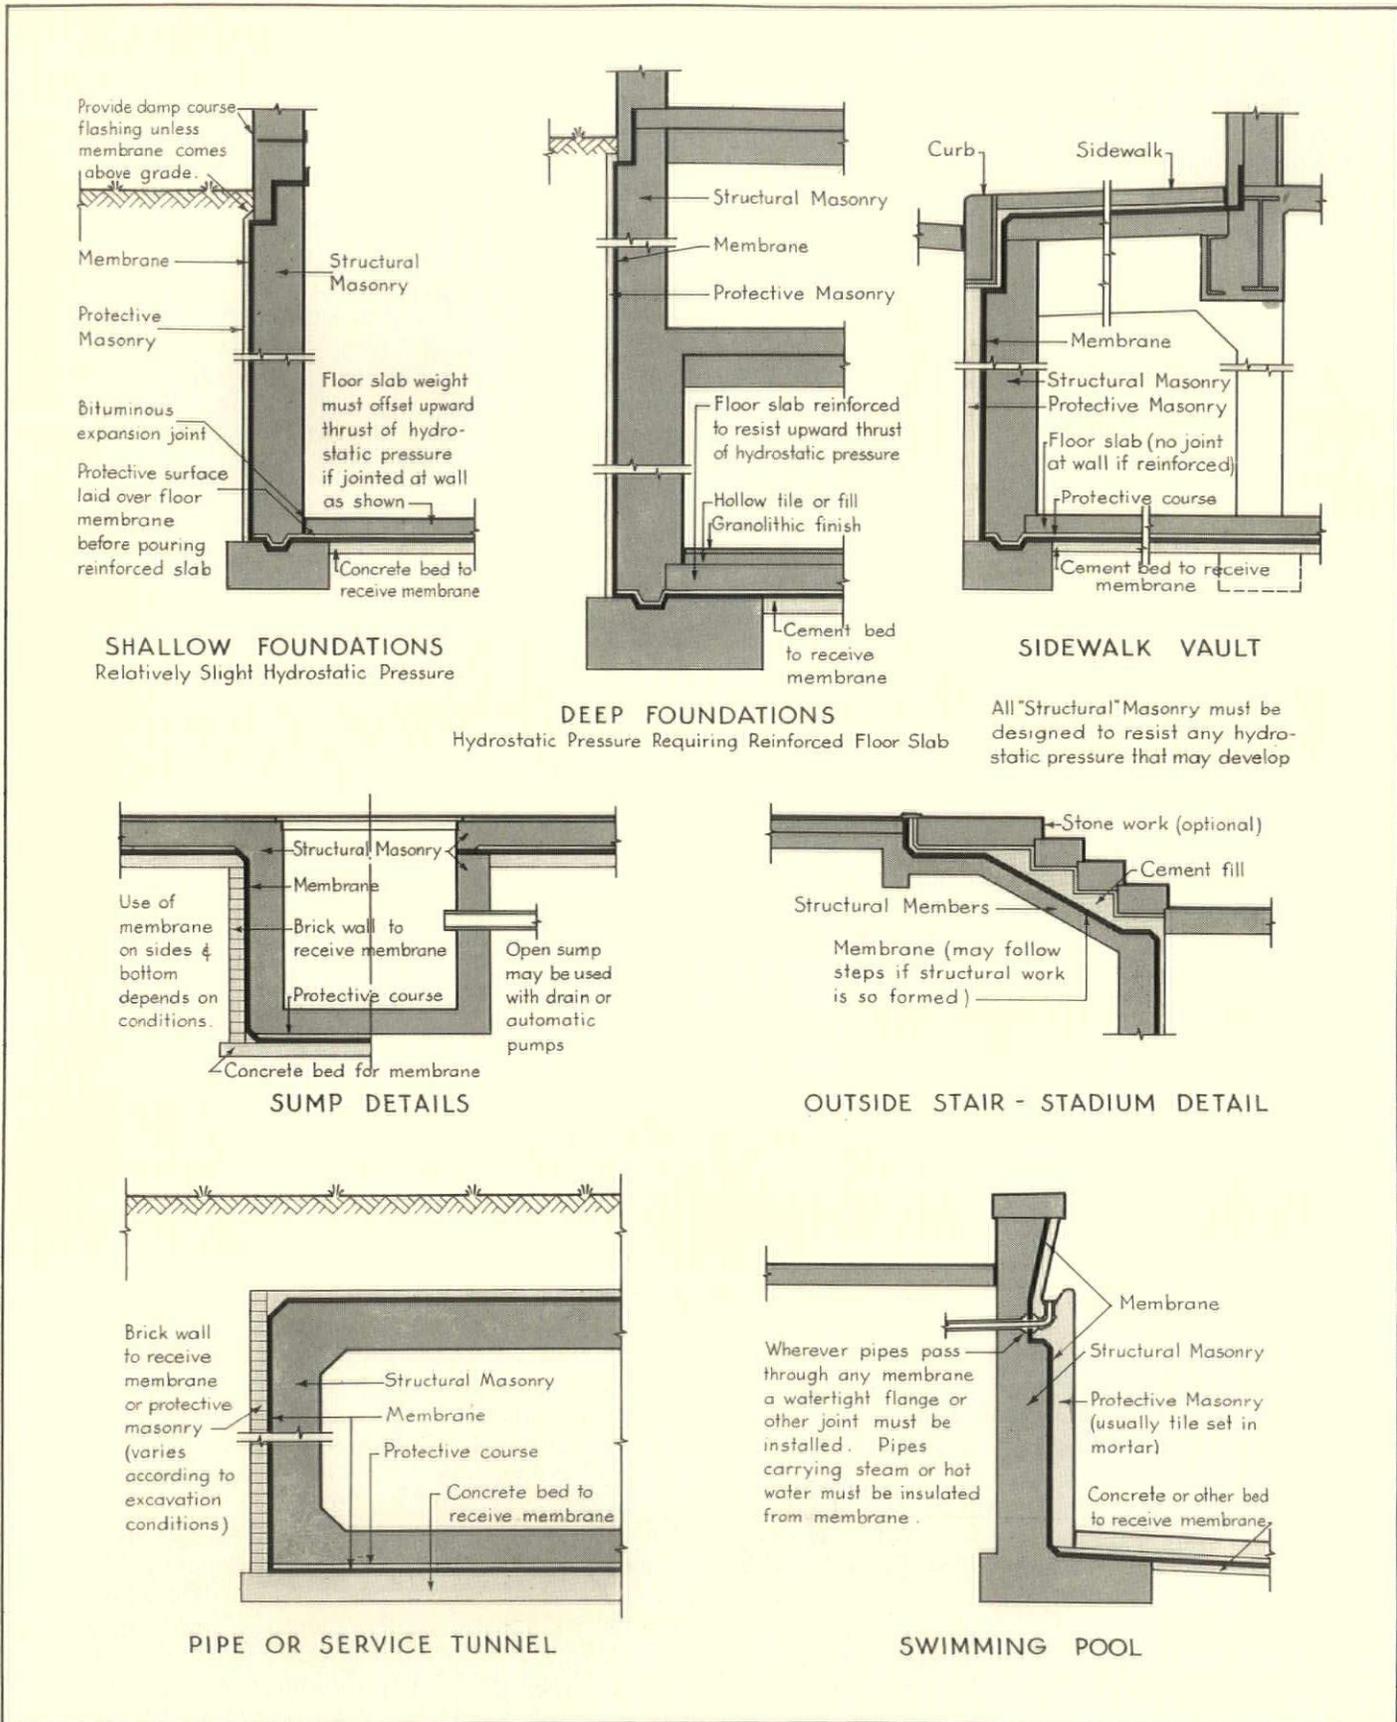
Common applications of membrane waterproofing showing normal position with respect to water pressure and use of protective course of masonry to prevent injury to envelope during construction. Installation details are omitted in this diagram
